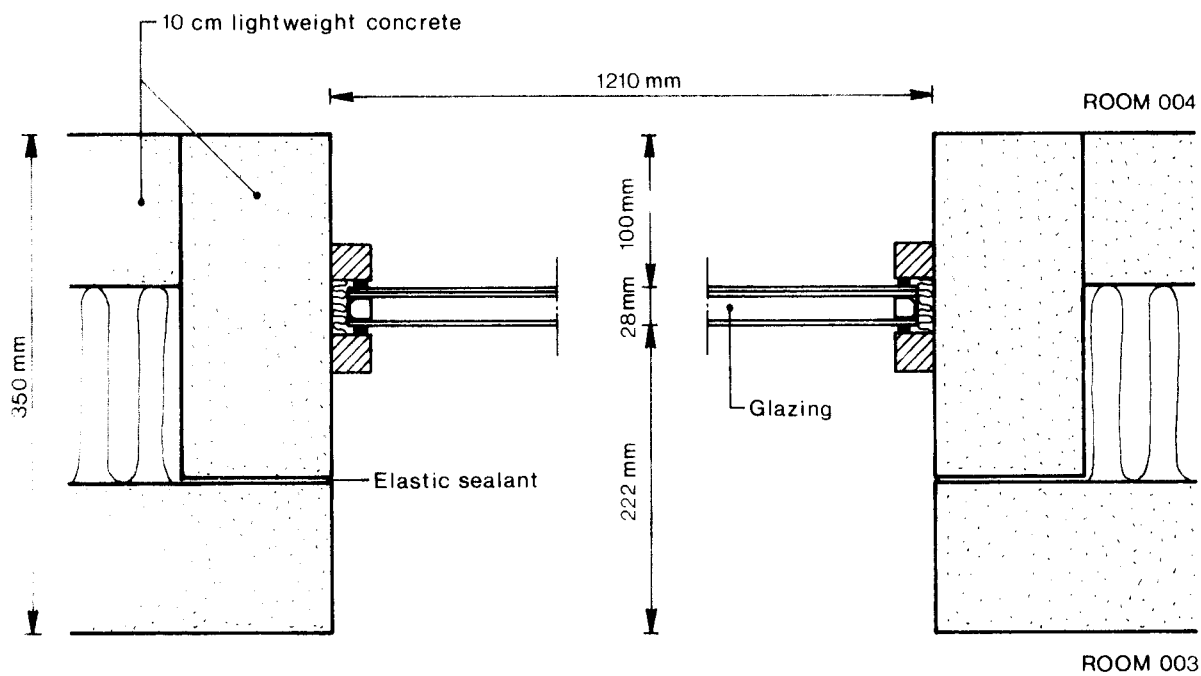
Glazing mounted in a flat test opening (NT 235-80). Horizontal and vertical section. Scale 1:5.
